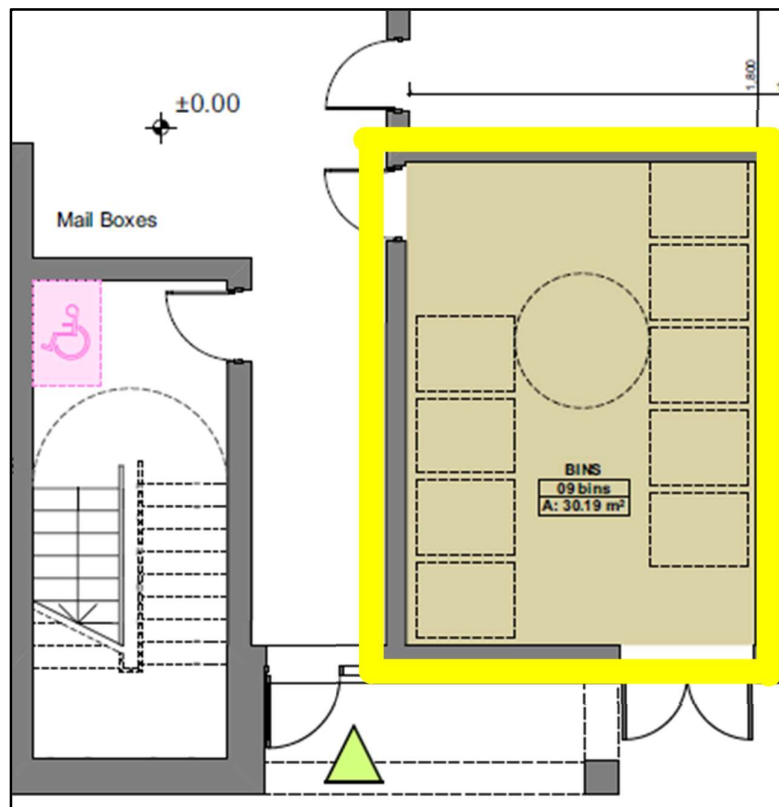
Internal Layout of Shared Waste Storage Area for Apartment Block B1 (Yellow) (Davey Smith Architects, 2025)
